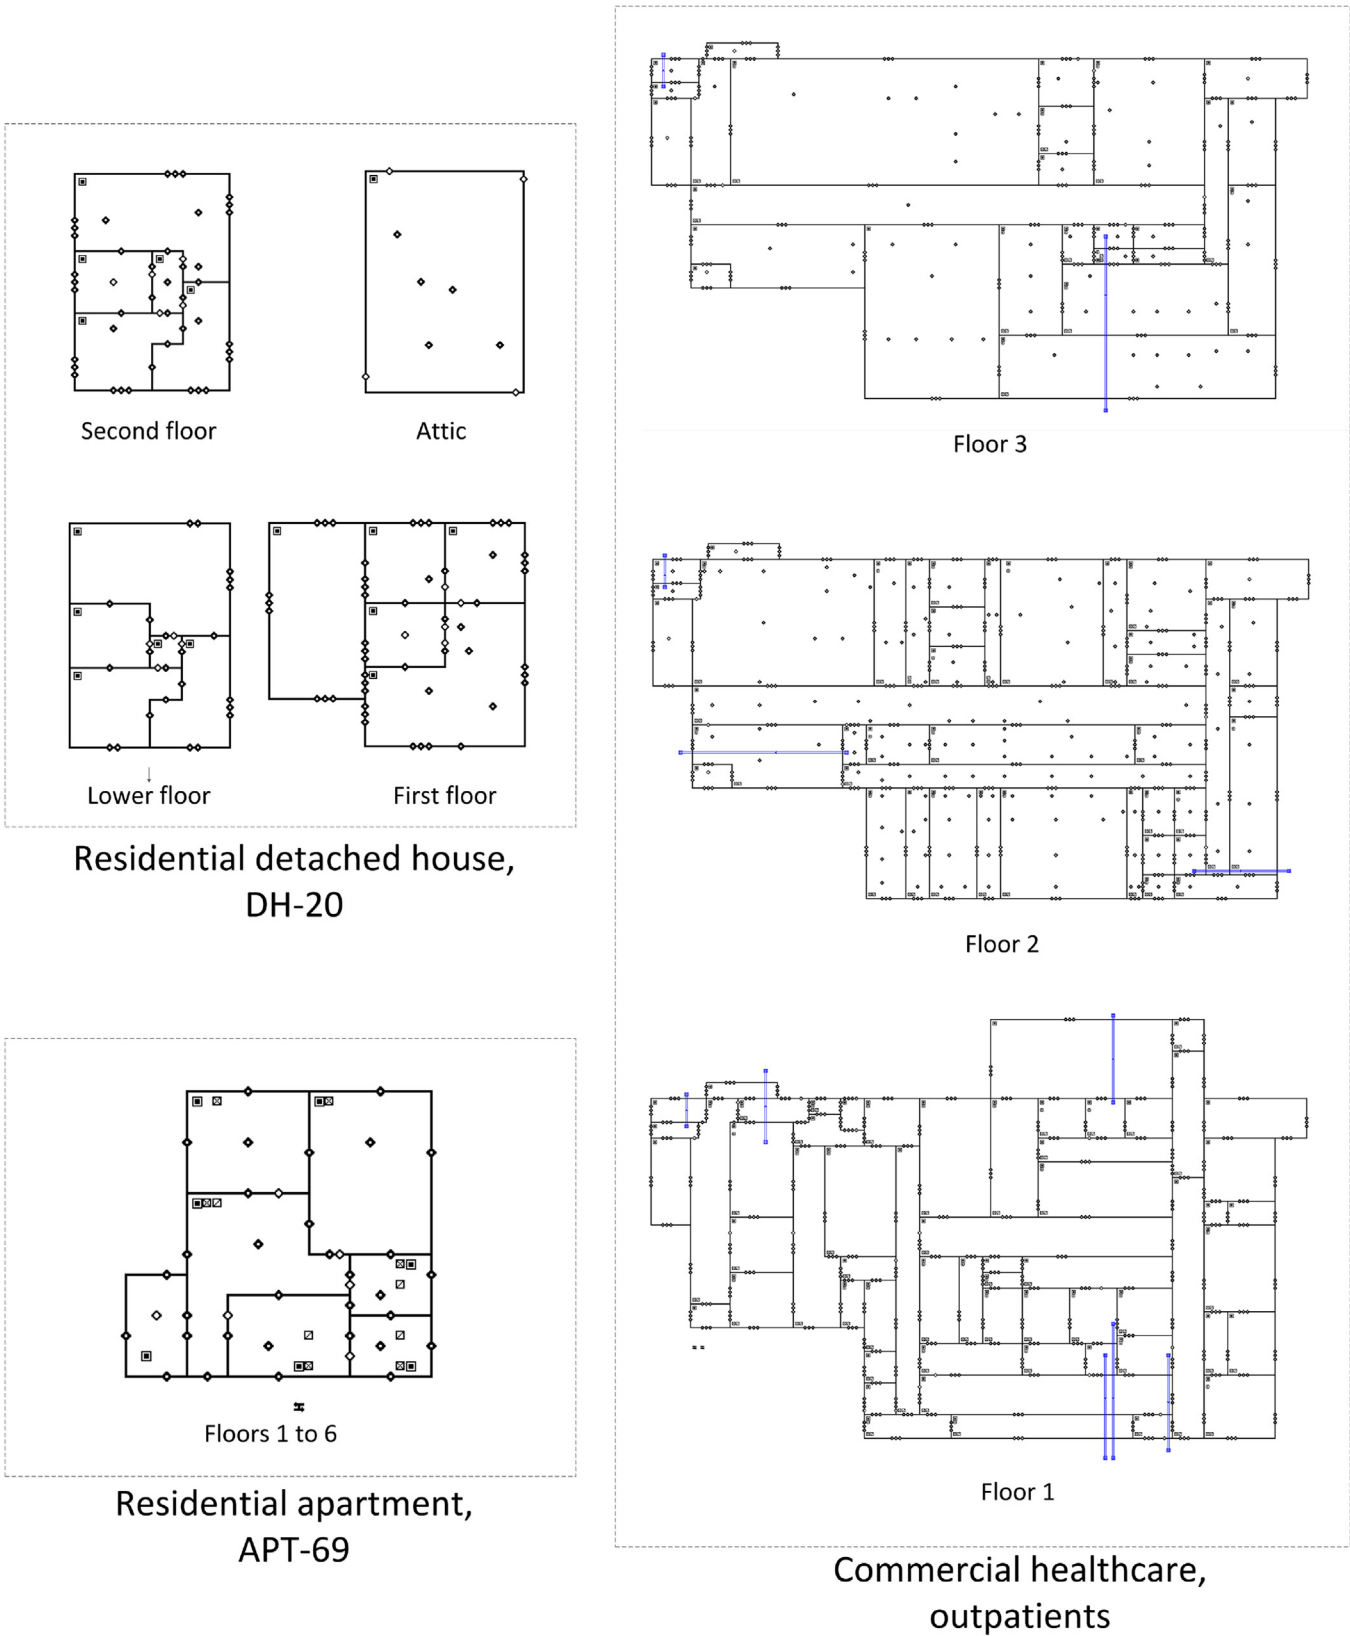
Building model floor plans as represented in CONTAM (not to scale).
